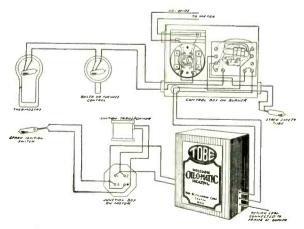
Wiring System of Williams Oil-O-Matic Burner.
